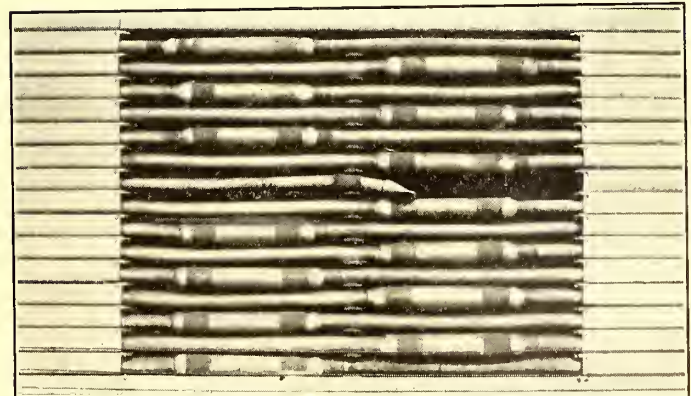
CABLE JOINTS, EARL'S COURT STATION
